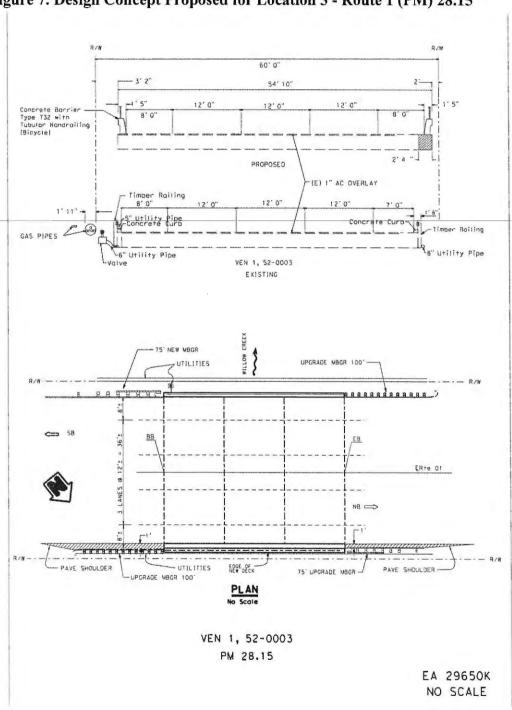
Design Concept Proposed for Location 3 - Route 1 (PM) 28.15
